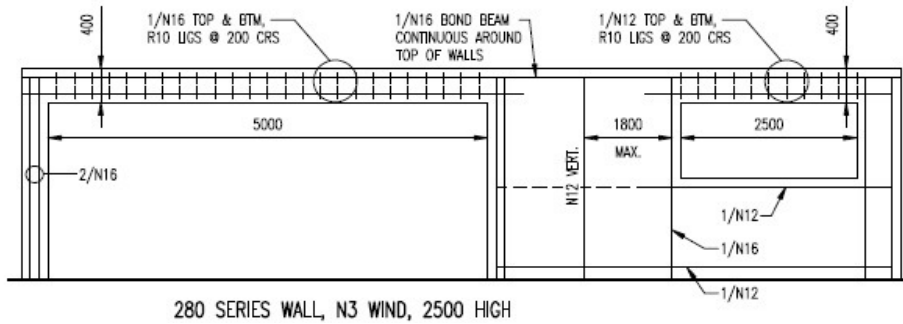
2500 High Wall, N3 Wind Rating, 280 Series ECO-Block (Max. roof load width: 6.8m)
